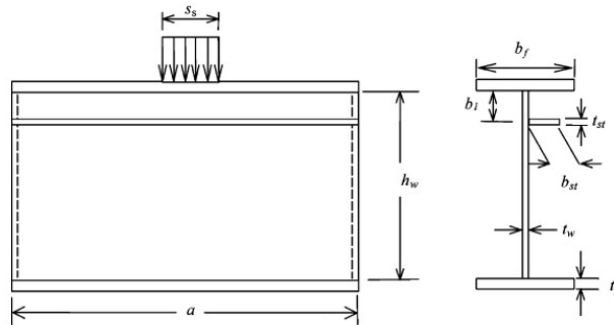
Longitudinally stiffened girder subjected to patch loading [12, p. 566]
